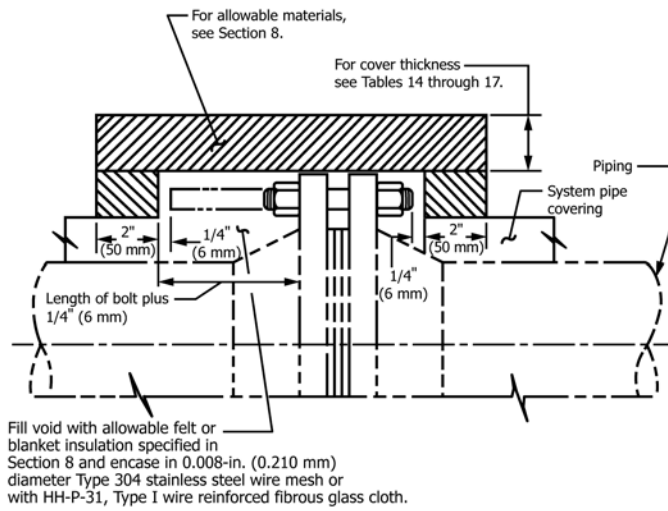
Typical Removable/Reusable Flange Blanket in Which Flange Diameter is Larger Than the Outside Diameter of the Adjacent Pipe Covering
